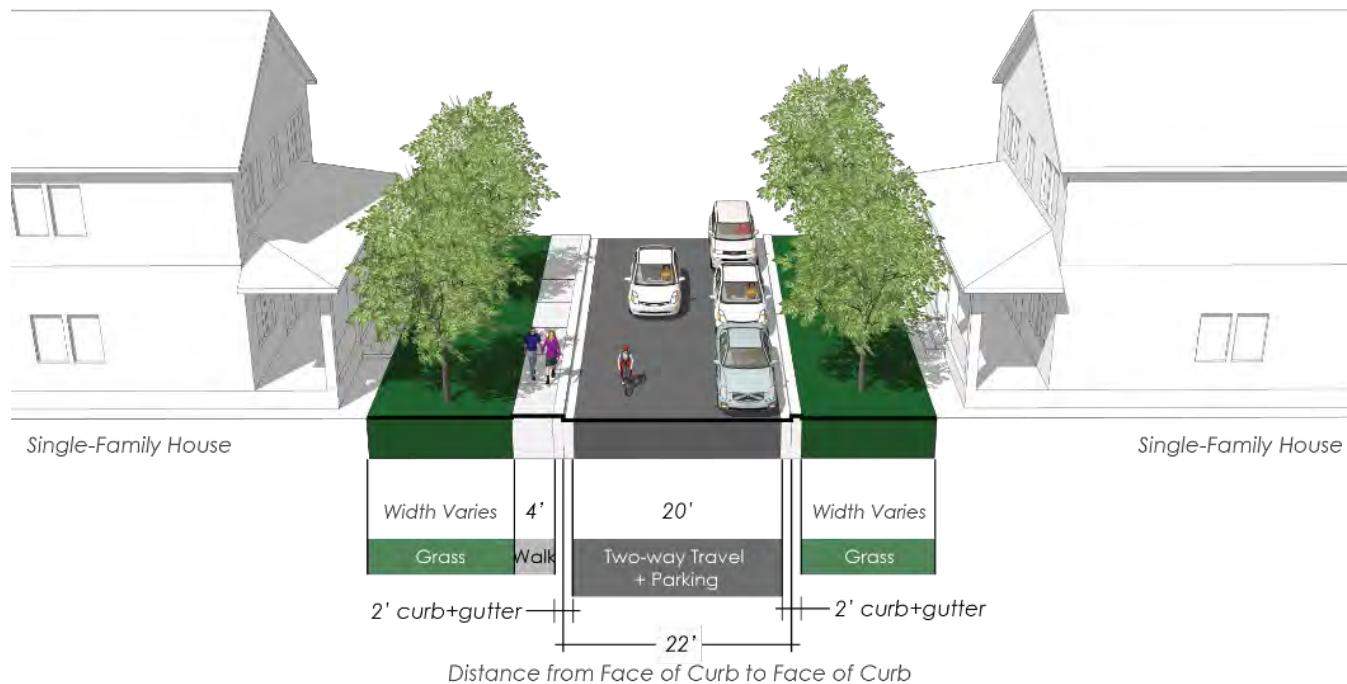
Harling Lane – Tilbury Street to Pearl Street (Looking East)
